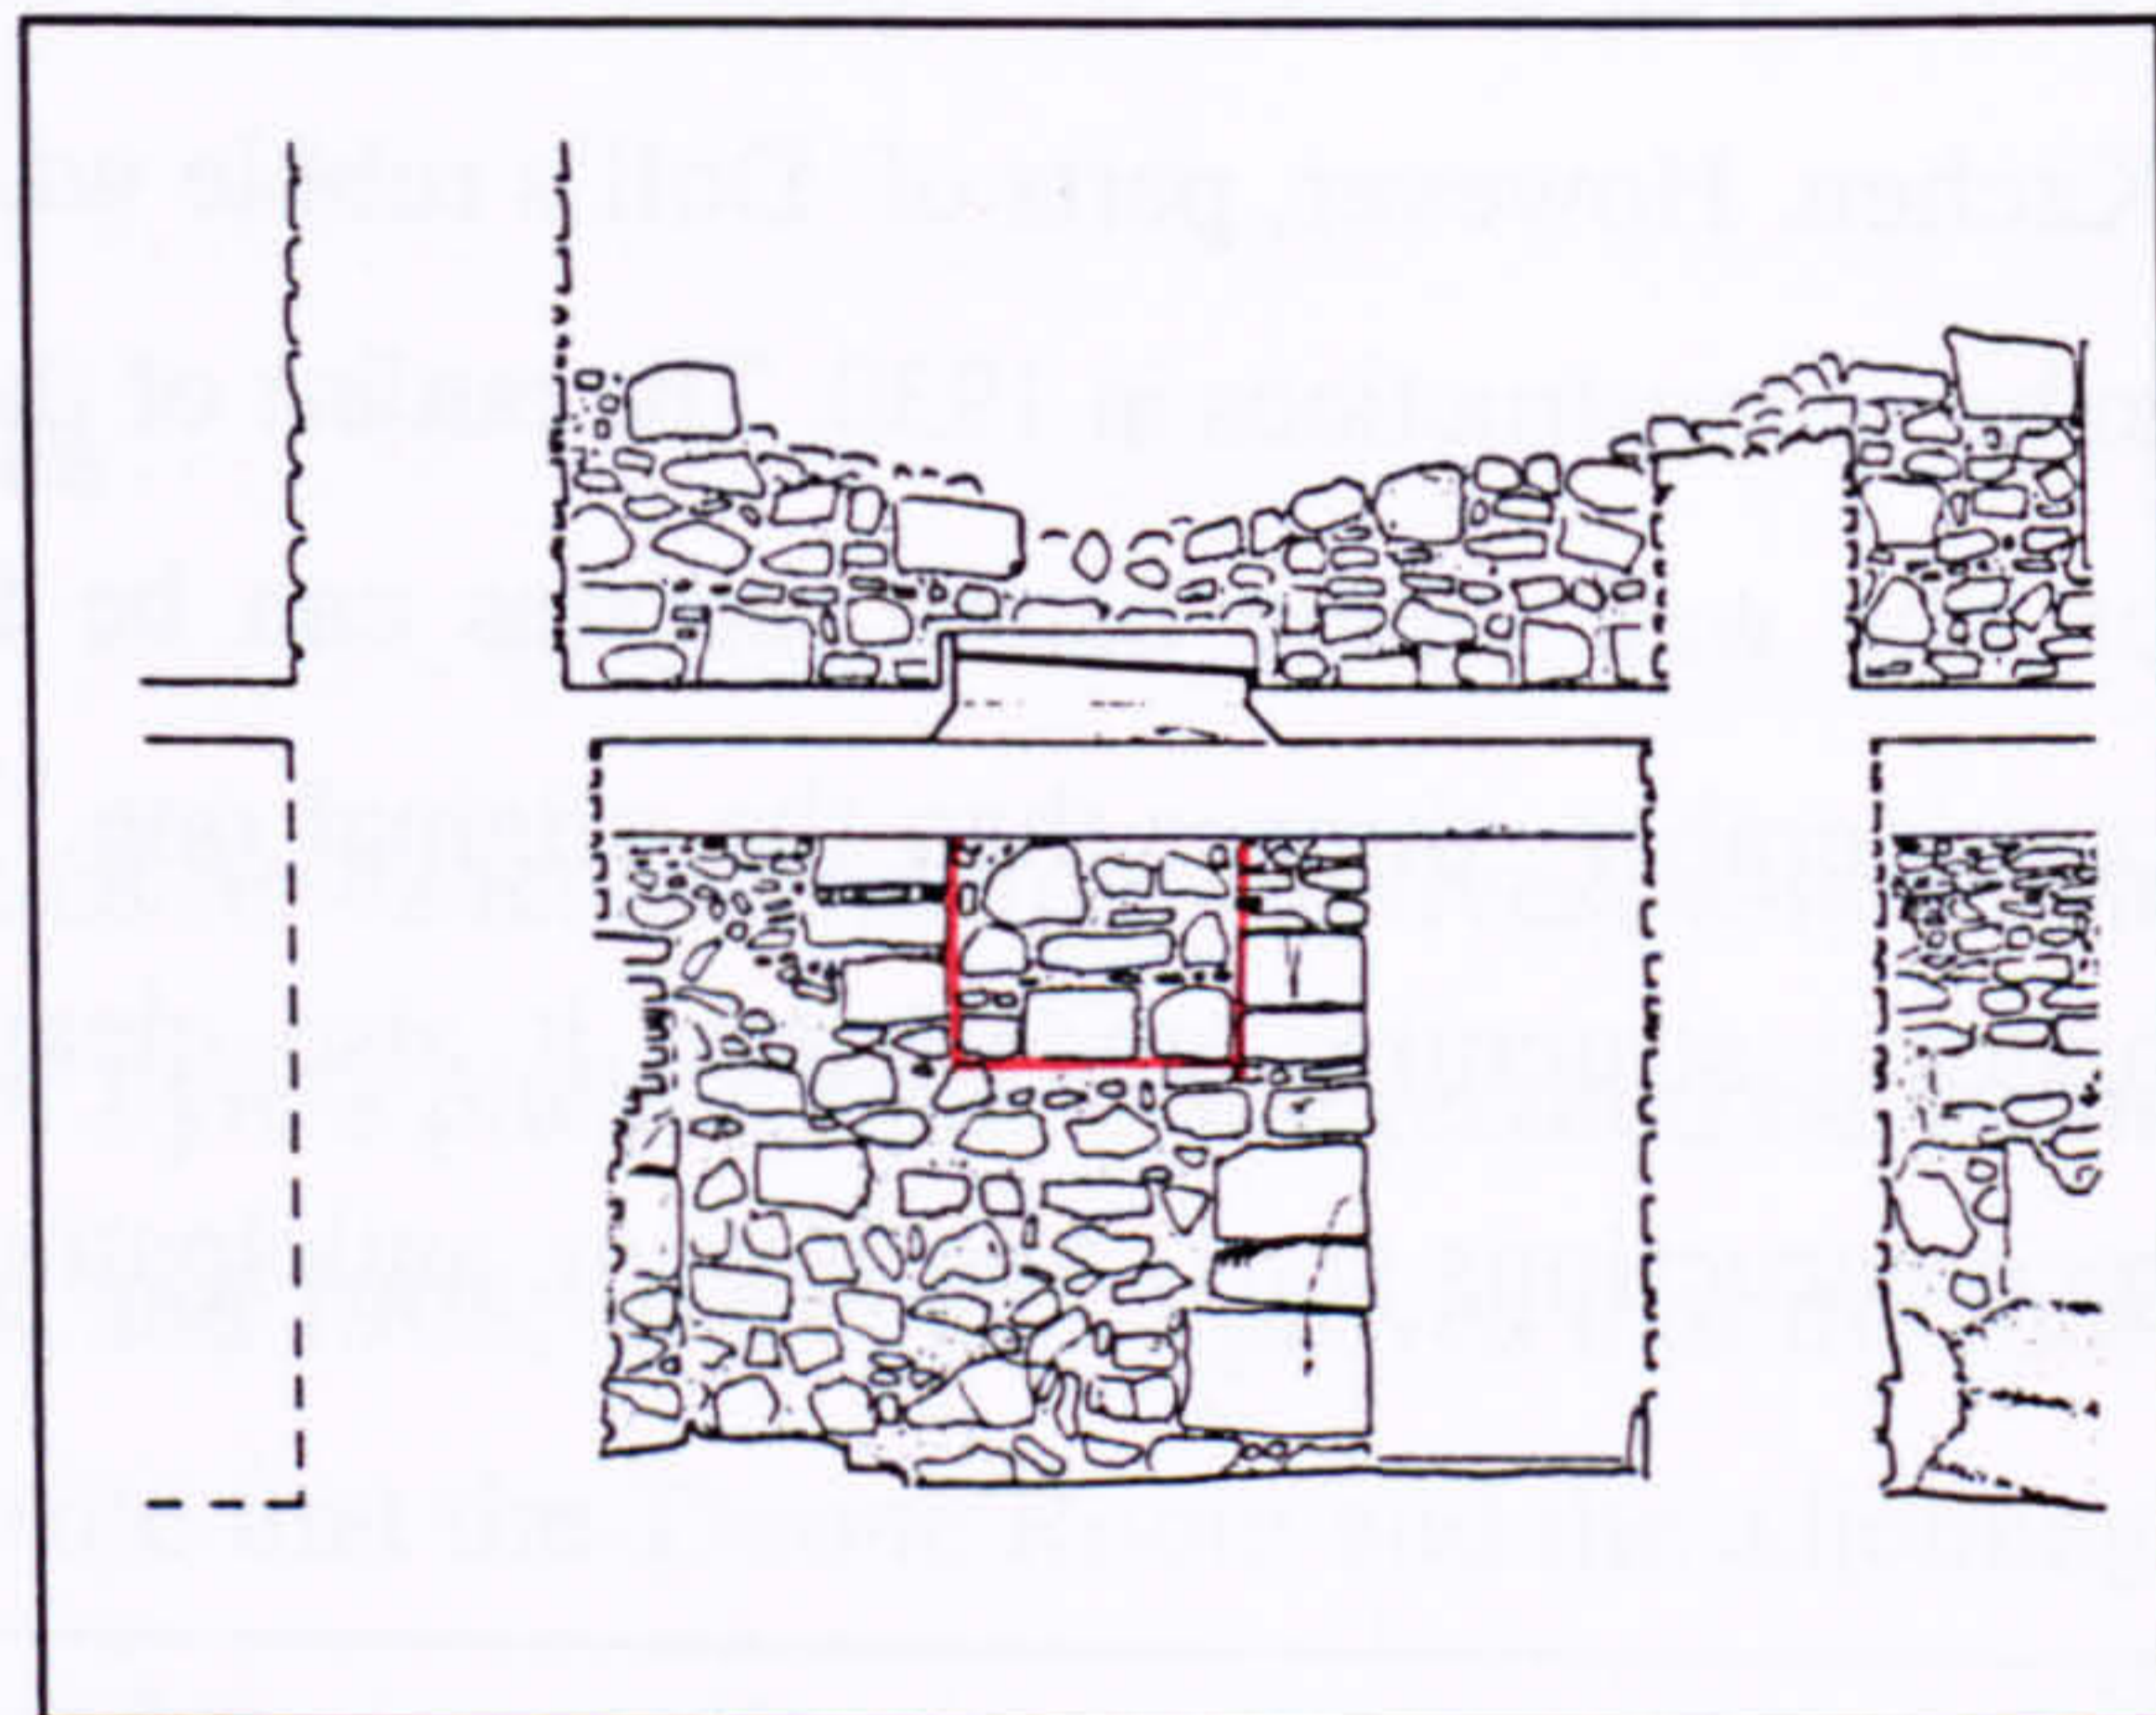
Elevation of north wall of the Kitchen of the Service Section. My recording.
